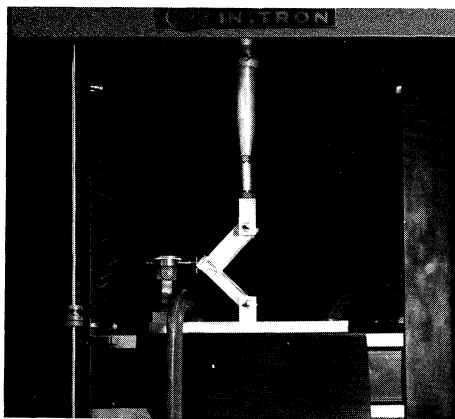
14 WF 103—21 WF 62 knee joint test setup
